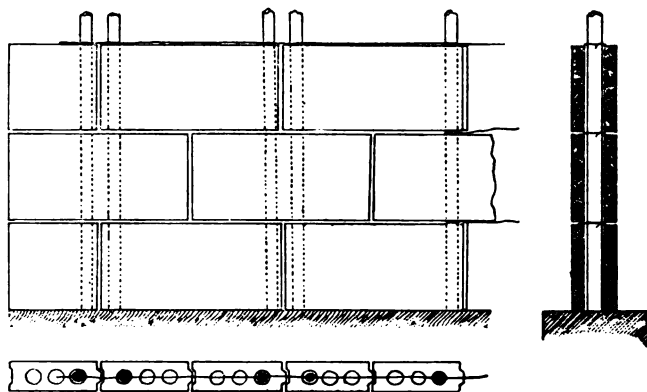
Gypsum boards fastened together with cement or gypsum rods.
